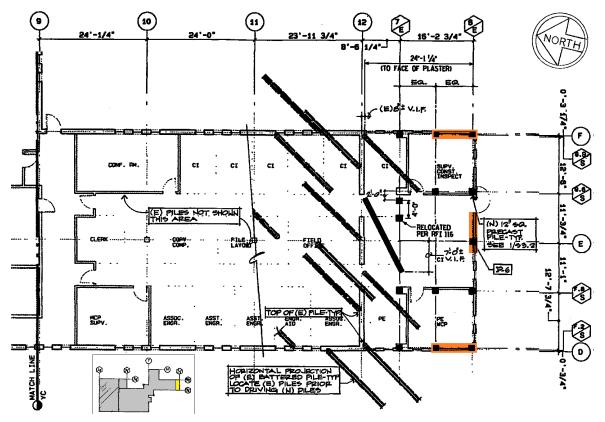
South Admin Addition – Pile Layout Plan Showing the New Shear Walls
